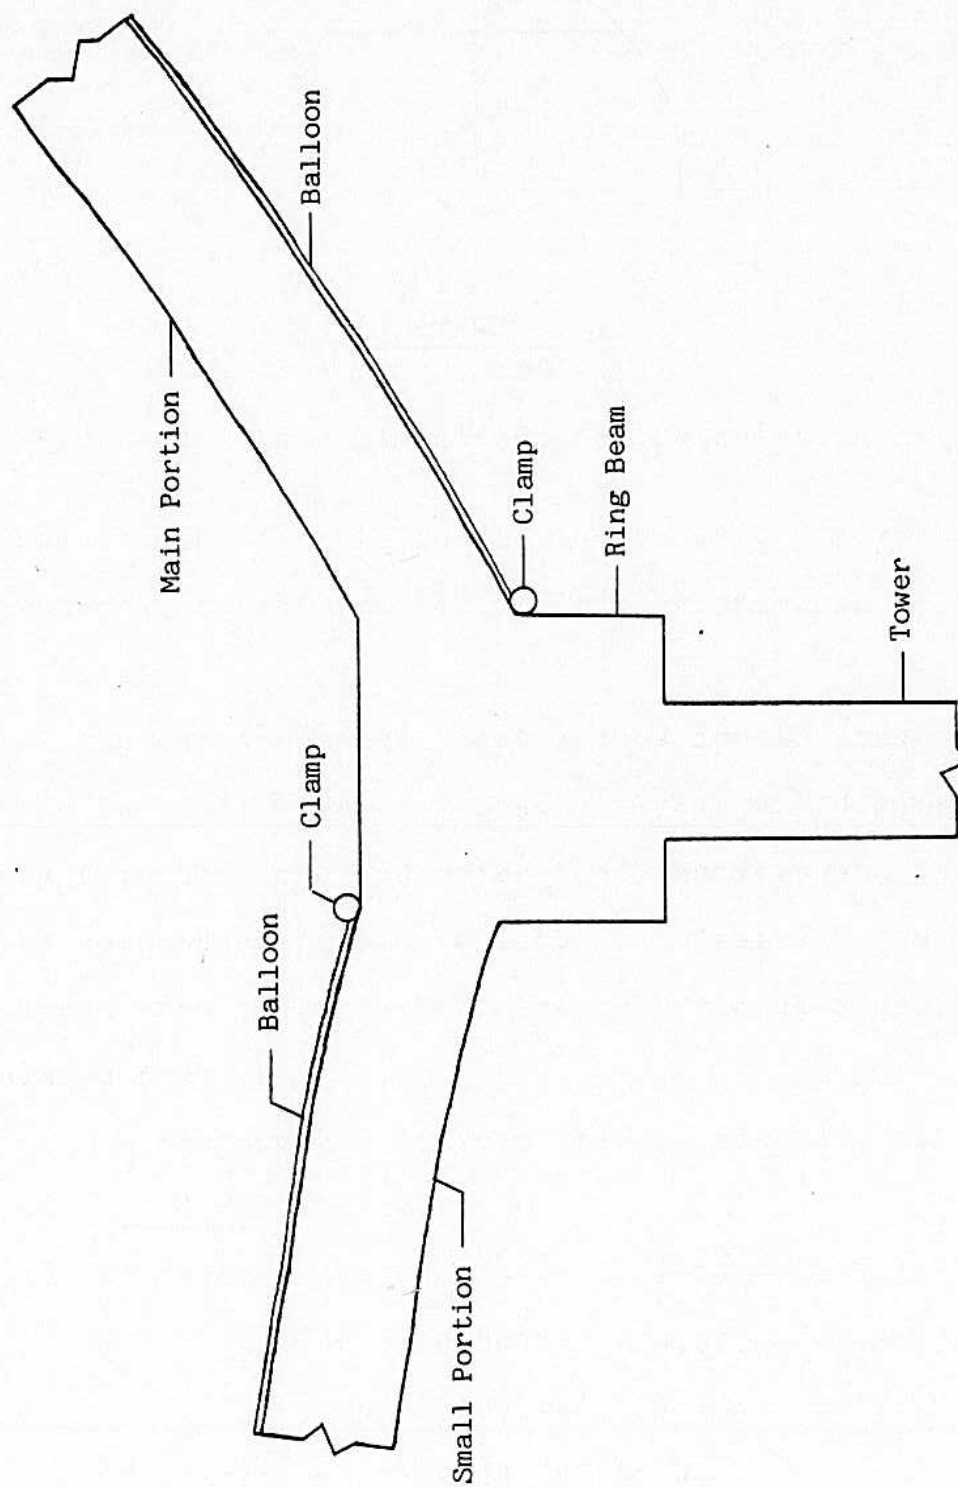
Cut Section of Ring Beam with Clamp Positioning
